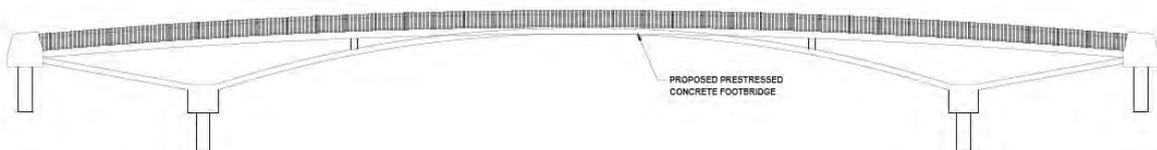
Pre-Stressed Concrete Arch Bridge
